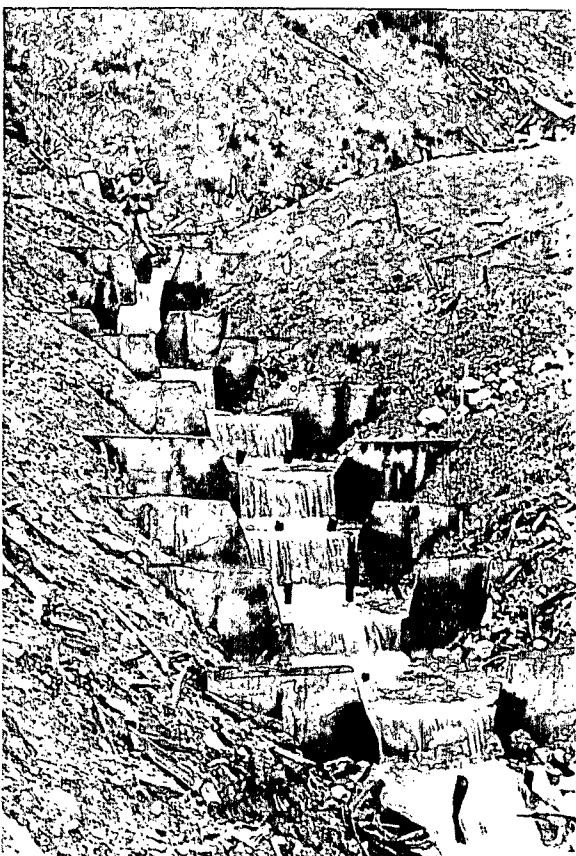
Redwood board checkdams in an excavated stream crossing, L-1-5 road.
